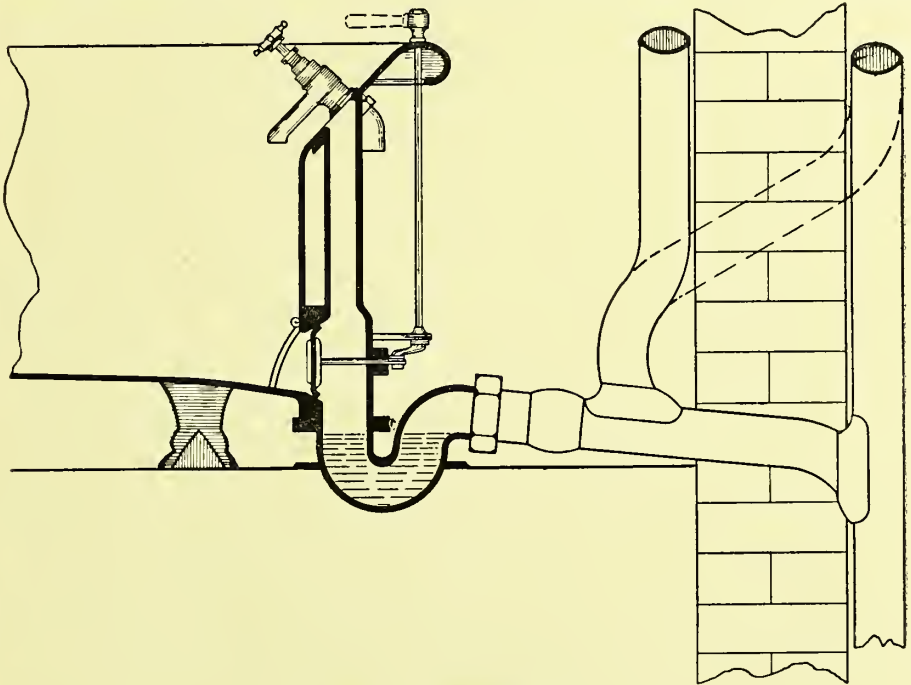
Waste and Trap-ventilating Pipes for Baths
